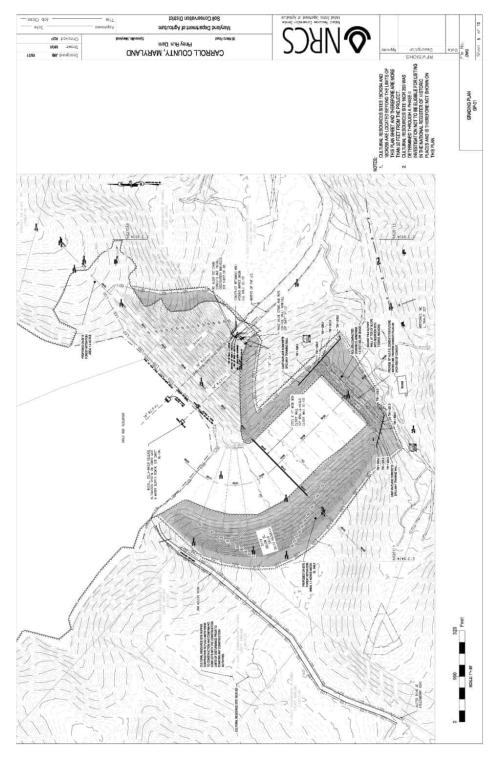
Piney Run Watershed Study plan showing the planned grading and Limit of Distrubance (LOD).
